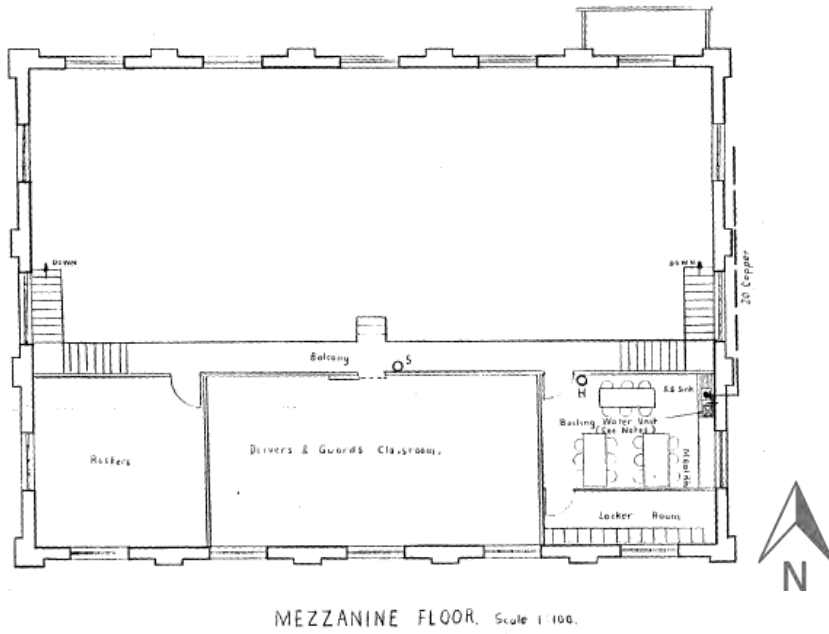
Plan of mezzanine floor added to the south side of the building, dated 1977. (Source: PTV Drawing Management System)
